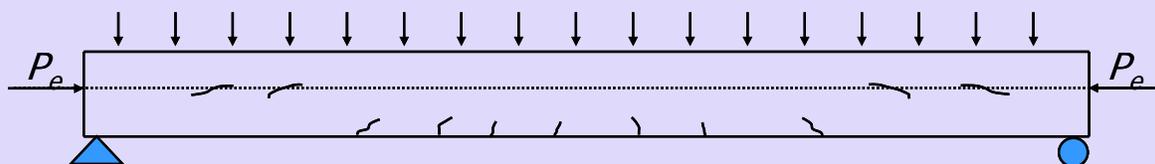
Formation of cracks in a prestressed beam
